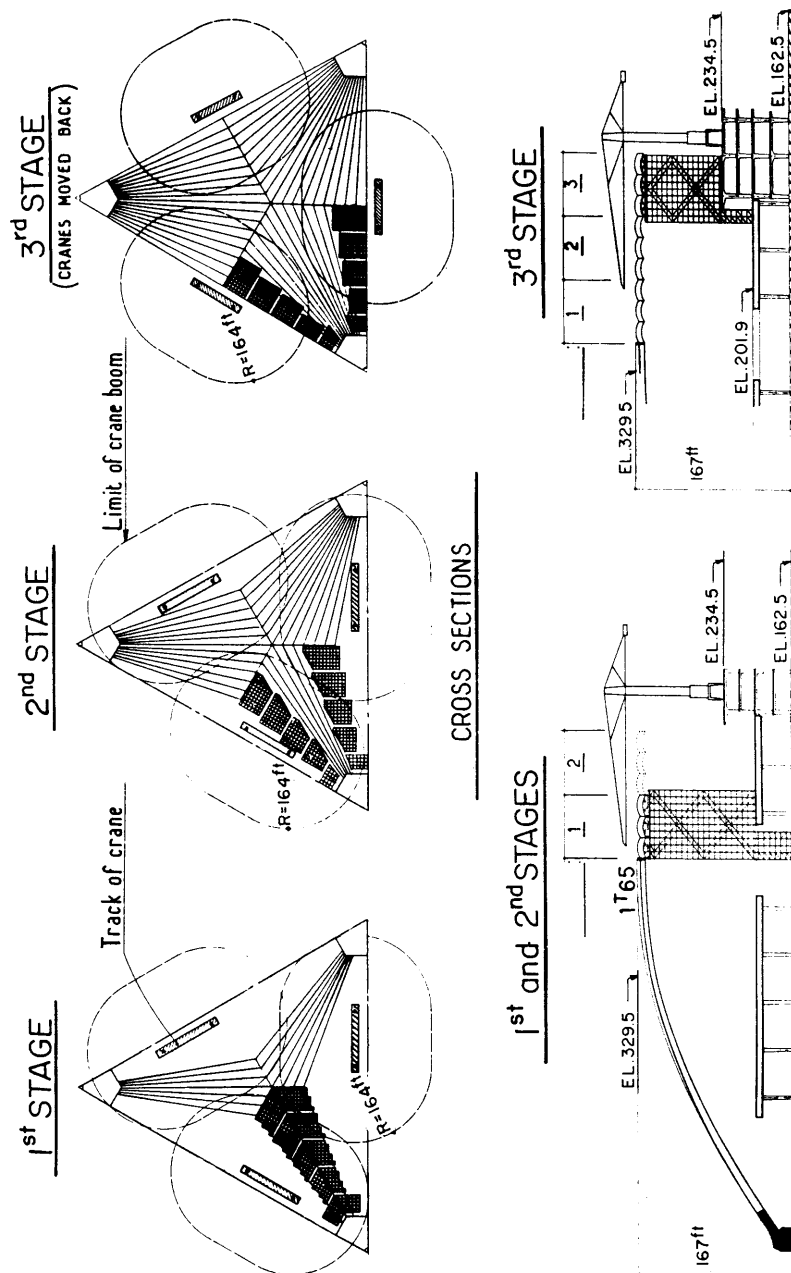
ARRANGEMENT OF TUBULAR SCAFFOLDING AND CRANES FOR THREE CONSTRUCTION STAGES.
